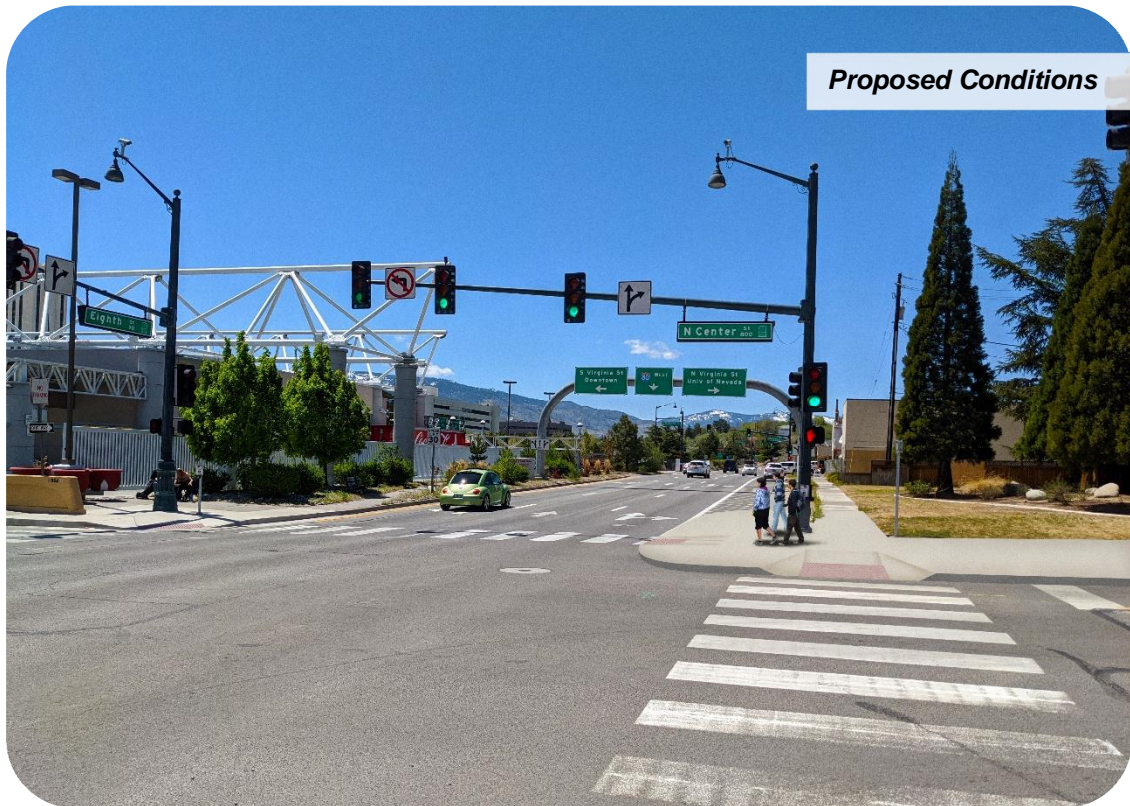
Center Street and 8<sup>th</sup> Street Photo Rendering
